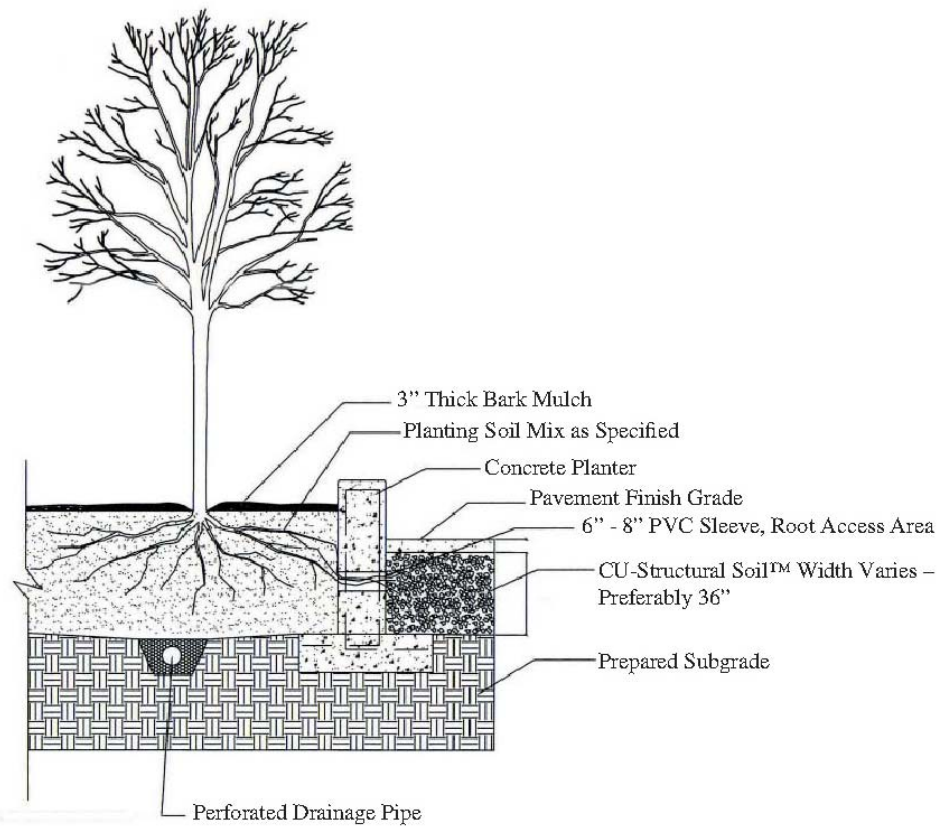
Limited soil volume planter with root access into CU-Structural Soil™ under plaza pavement
